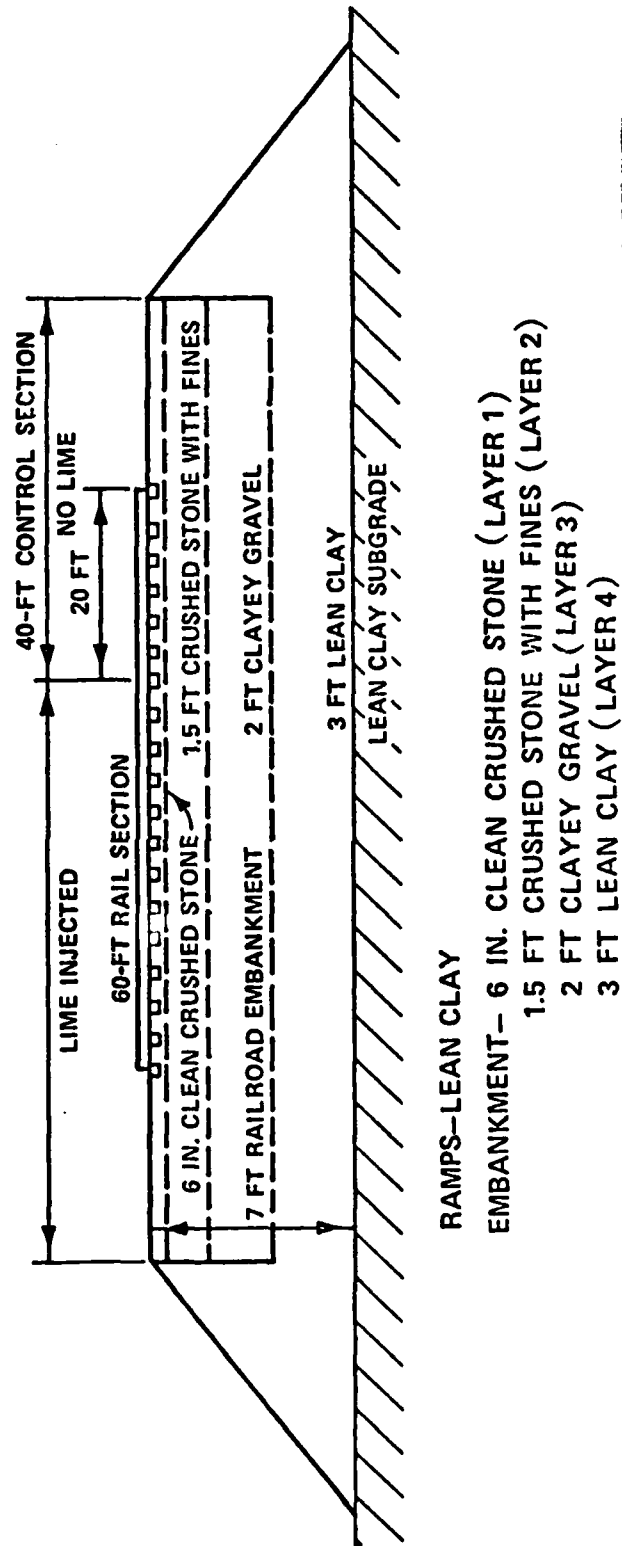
LONGITUDINAL CROSS SECTION PARALLEL TO THE RAILS OF THE WES RAILROAD TEST EMBANKMENT
